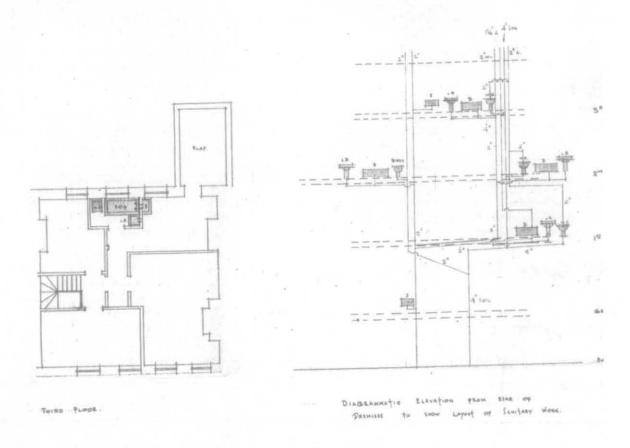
Plans of interior in 1951 (Drainage Plan, RBKC)
